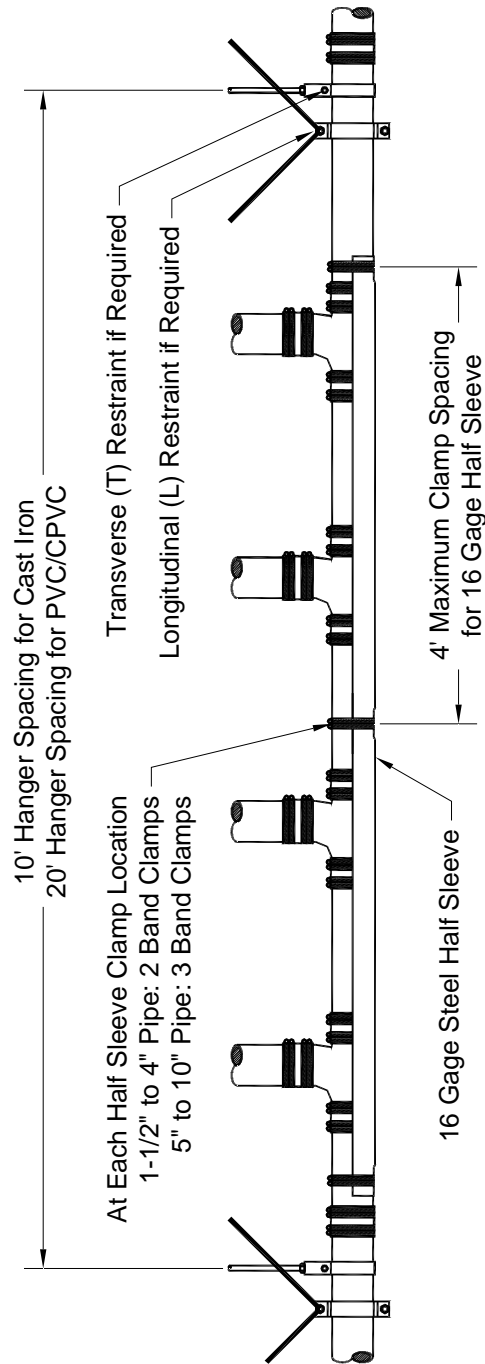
; 16 Gage Steel Half Sleeve Used to Carry Tensile Loads Across Many Fittings
